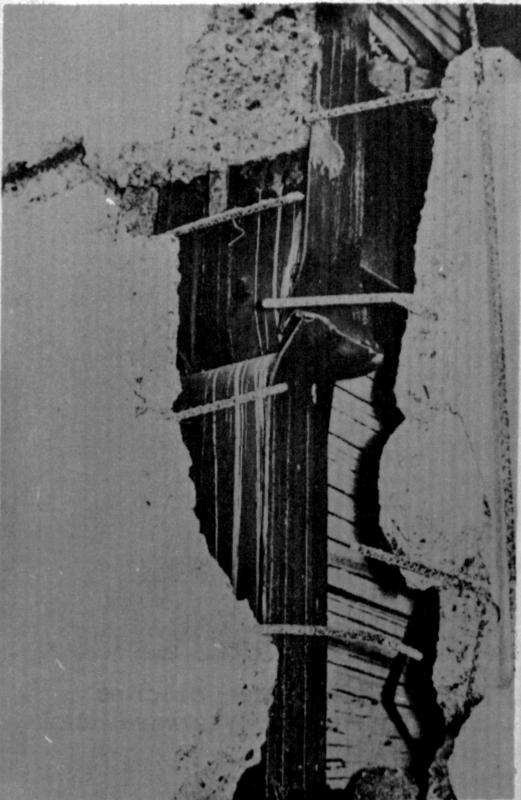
Cordova Building. Steel column failed due to stair framing into this column which greatly increased column stiffness, thereby bringing most of the lateral force to this column.
